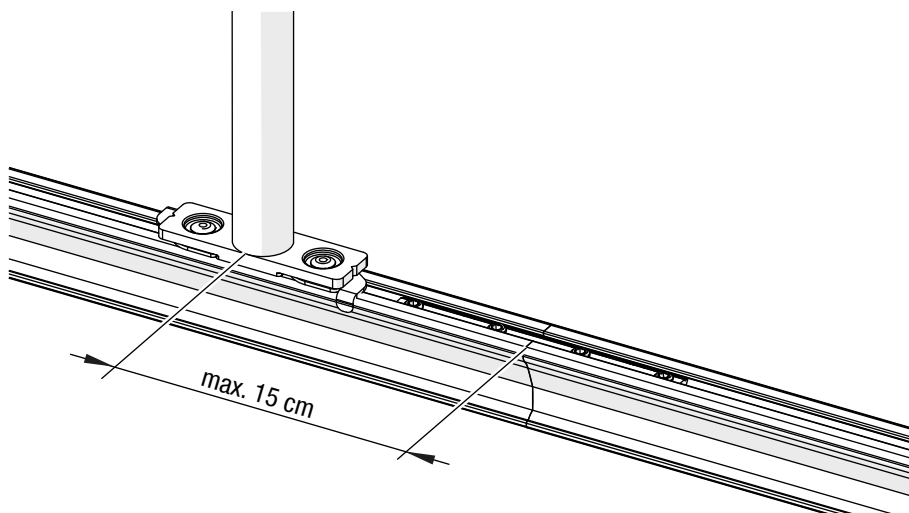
Ceiling installation OFFICE suspension – Suspension distance to the joint
